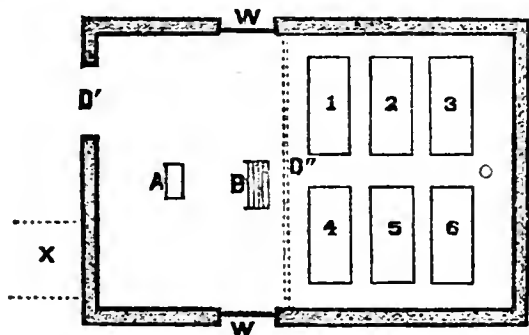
Plan—Double Wall, filled with Sawdust.
